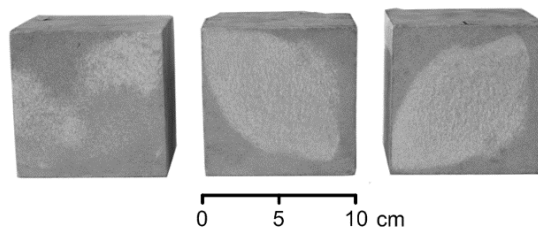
Selected post-test saw-cut surface of Double fracture shear device.
